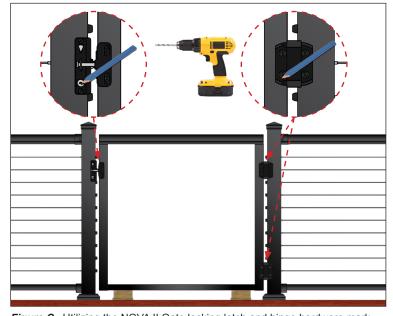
Figure C. Utilizing the NOVA II Gate locking latch and hinge hardware mark holes with a pencil and pre-drill holes with a 5/32" drill bit.
